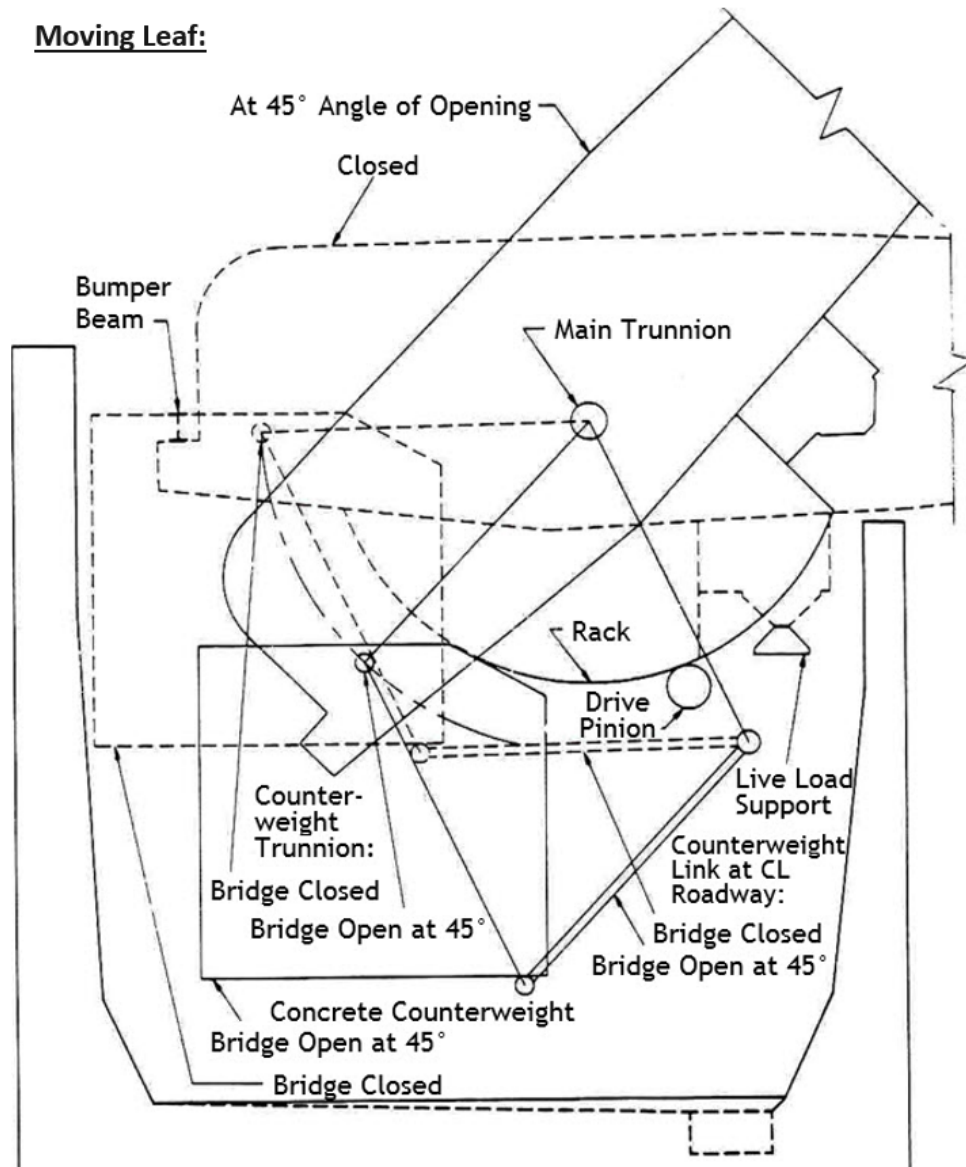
Multi-Trunnion, Strauss Type Bascule Bridge
